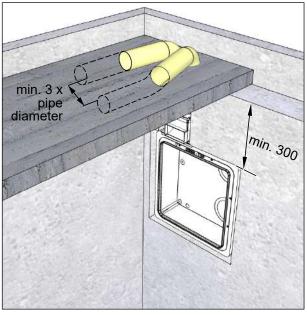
Flexible pipe layout planning example, dimensions in millimetres
